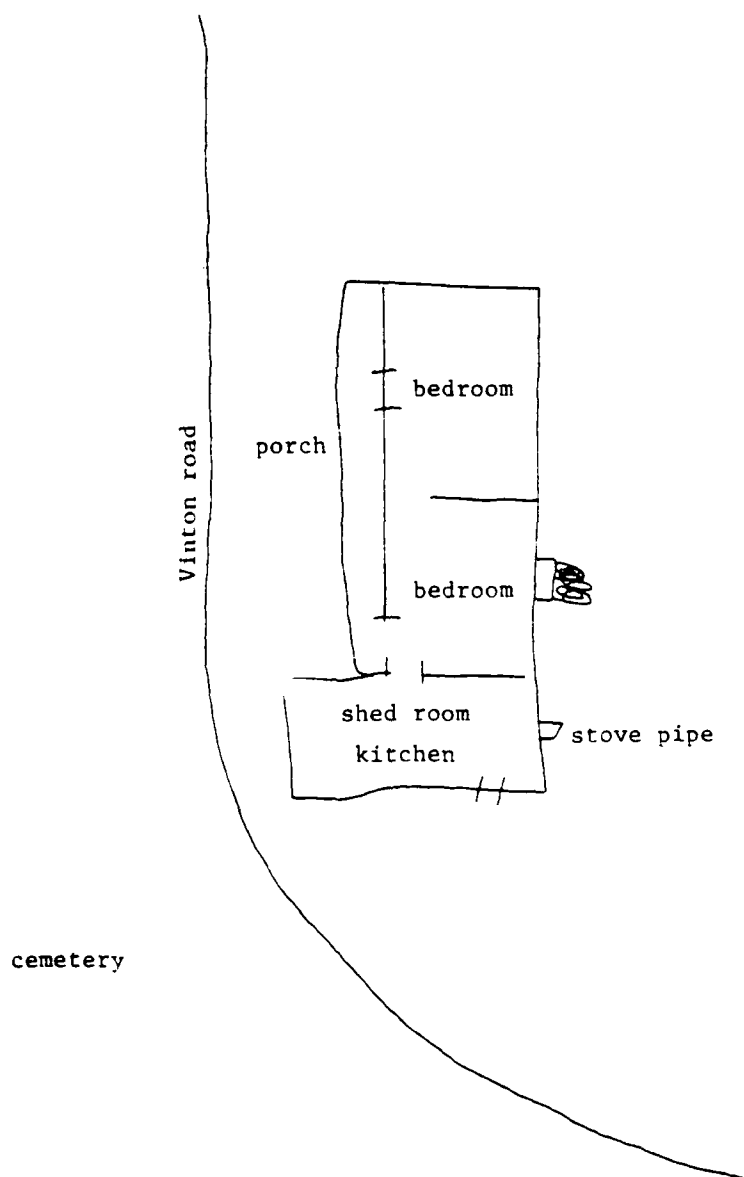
Floor plan of the Perkins house. (previously the Vinton general store) Drawing by Josie Kennedy. (original reduced by one-third)
